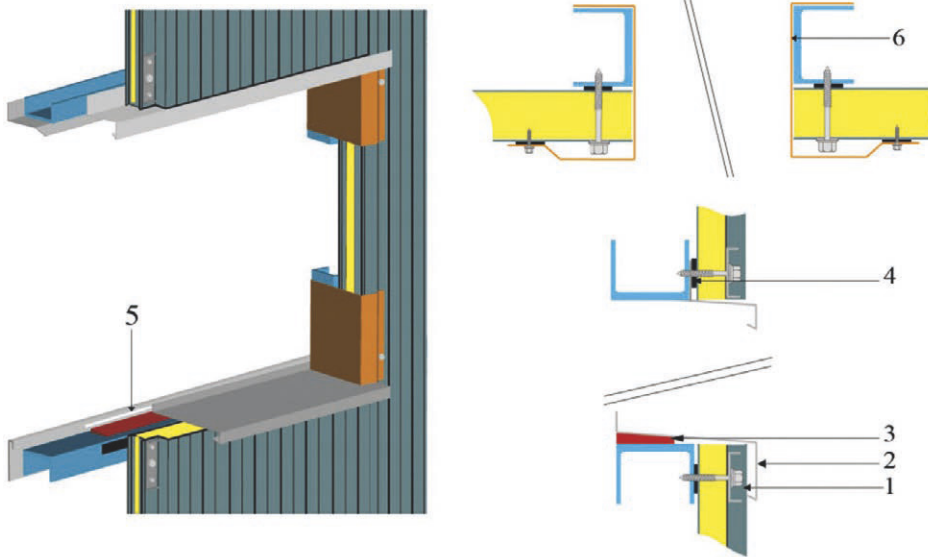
Transverse junction – Vertically installed panels with hidden fixings
